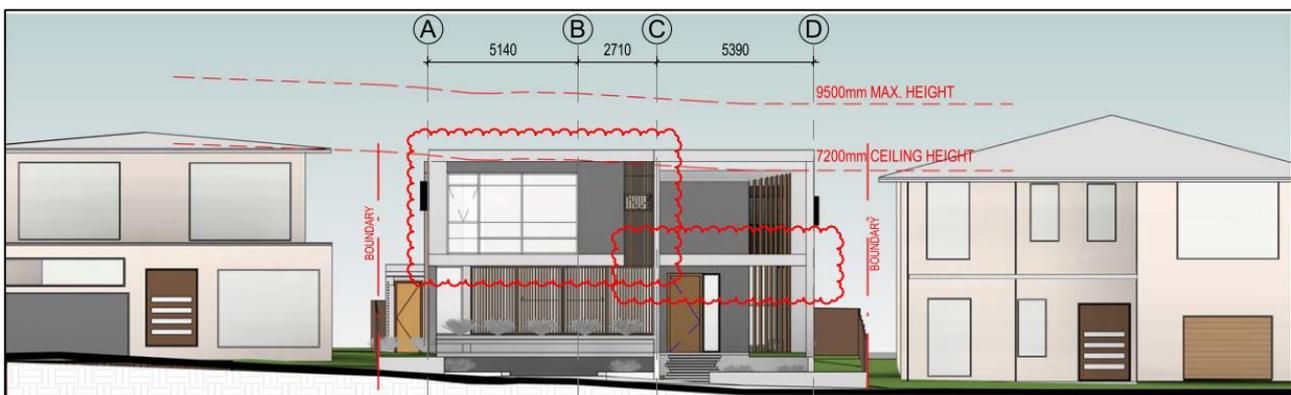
Streetscape elevation demonstrating heights of the proposed dwelling amongst existing development immediately adjoining the site.
